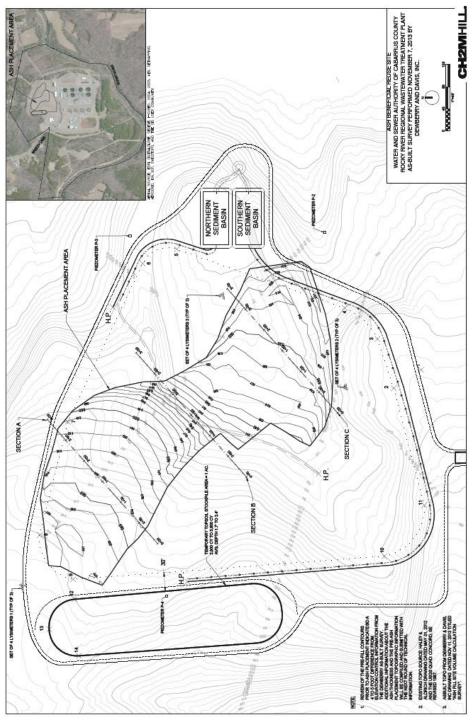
Rocky River Wastewater Treatment Plant biosolid ash application site plan view
